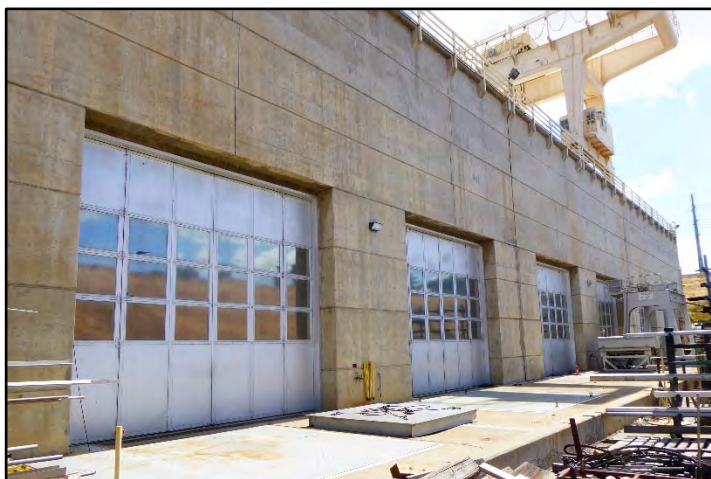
East elevation of Pumping Station; camera facing west, May 9, 2022. (A00145)
